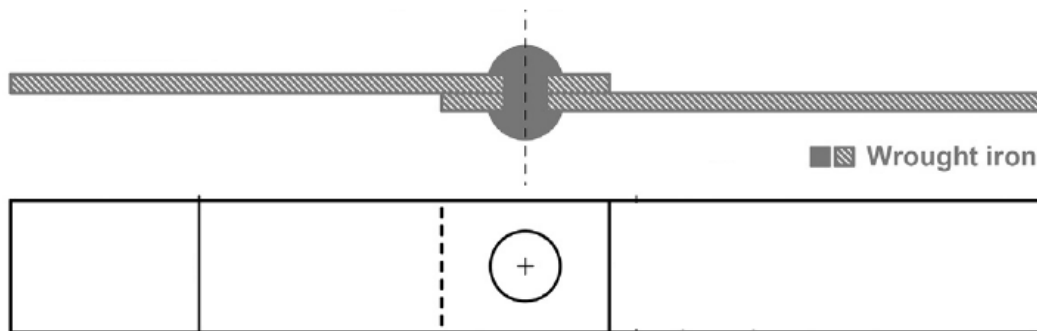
Elevation and plan views of a riveted specimen (Collette, Sire, & Wouters, 2014)
